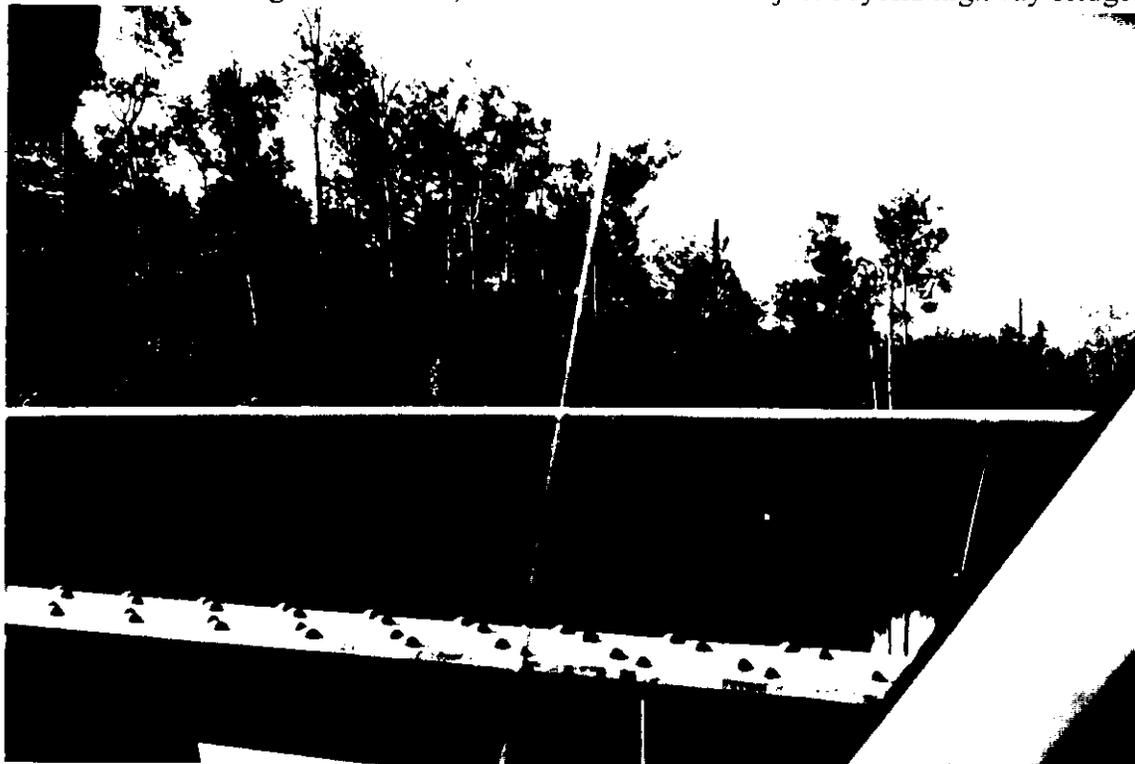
Proceeding east on Rt. 3, view from highway bridge looking at access road.
